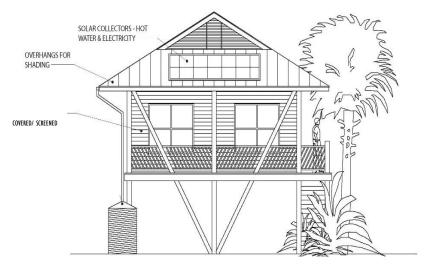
Alternative D, Conceptual Cottage Design (final design to be determined when site design is complete)
